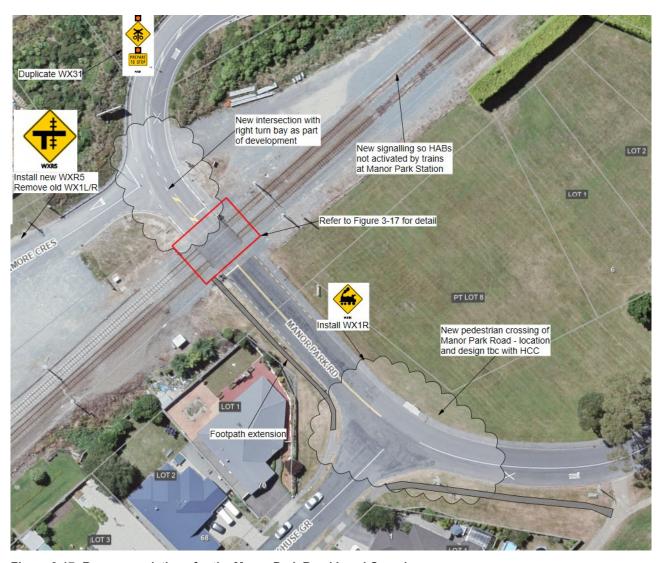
Recommendations for the Manor Park Road Level Crossing
